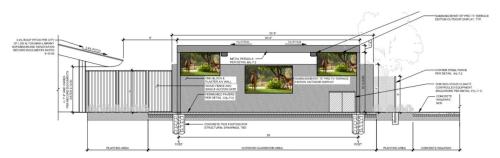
Elevation of the wall at the pergola of the proposed project, revised drawings dated 12/10/2024 (SSA Landscape Architects).
